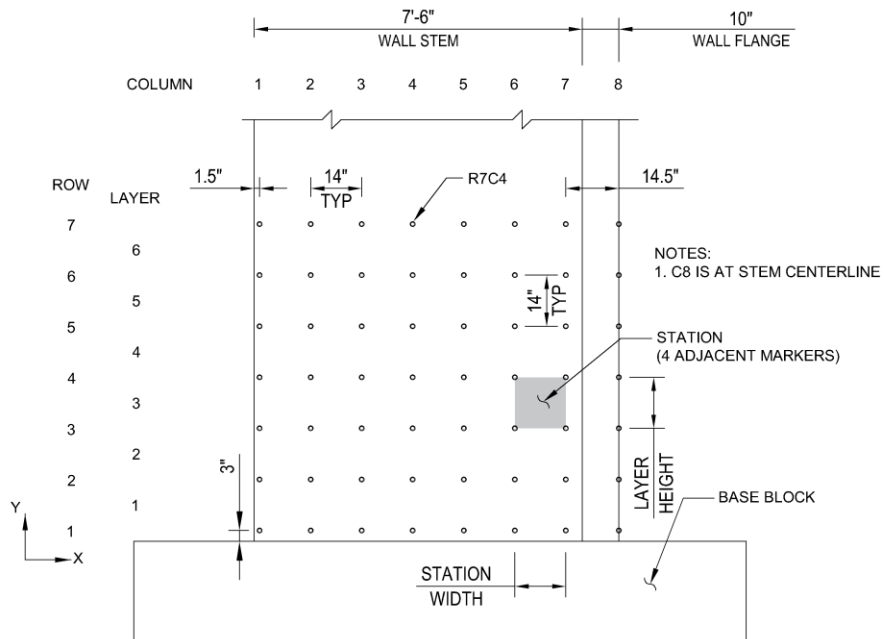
Locations of optical markers on wall stem (1 in. = 25.4 mm)
